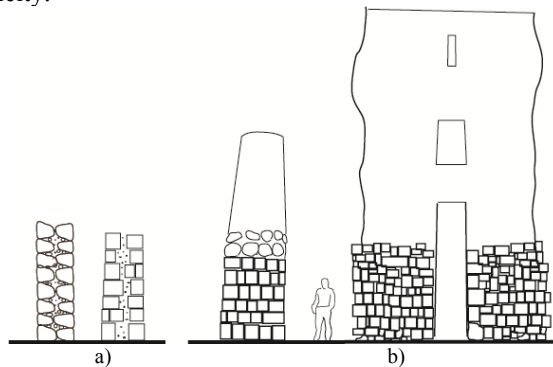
a) Section of Stone wall with clay mortar fill, b) Inca's adobe wall, Templo de Wiracocha, Cusco.
